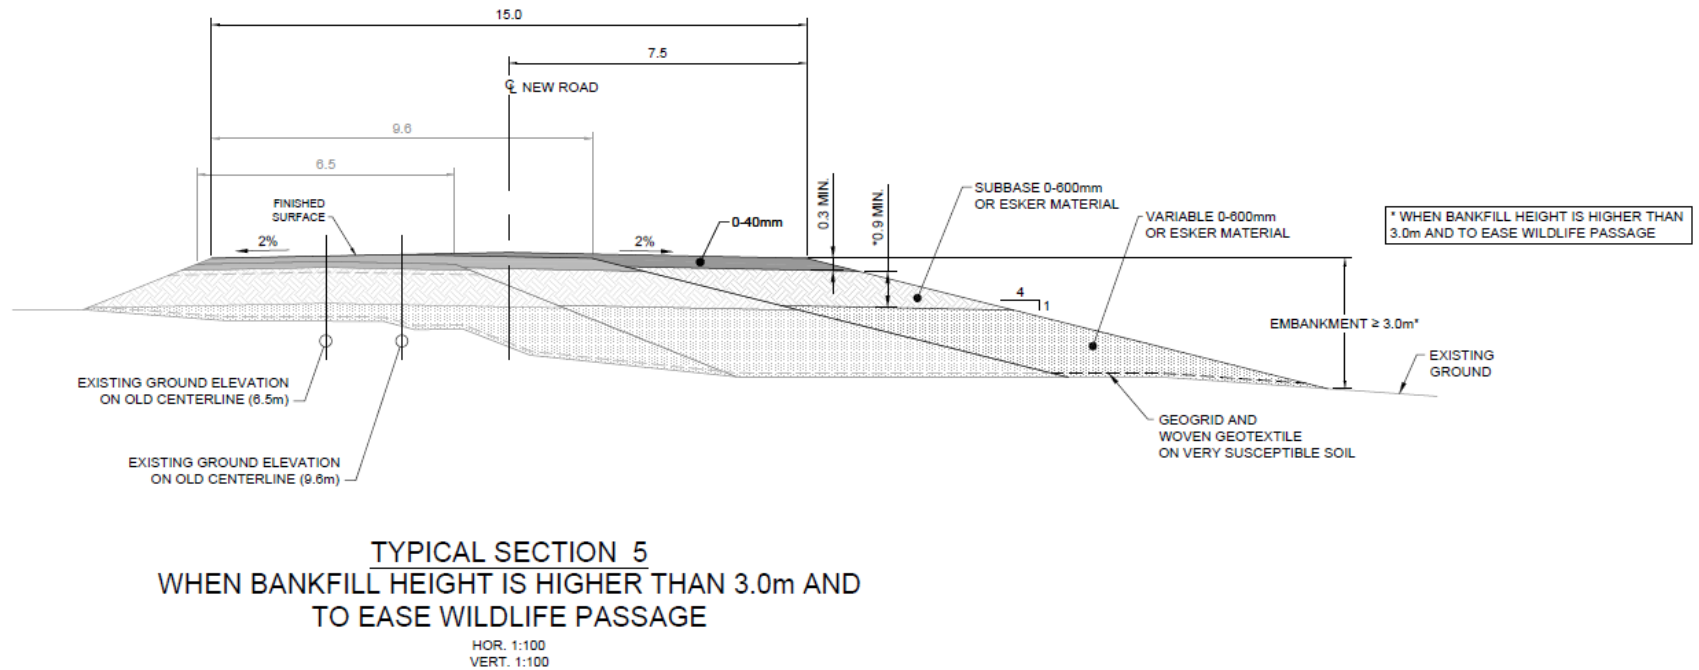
As-built of a portion of the Haul Road built with 4:1 slopes
